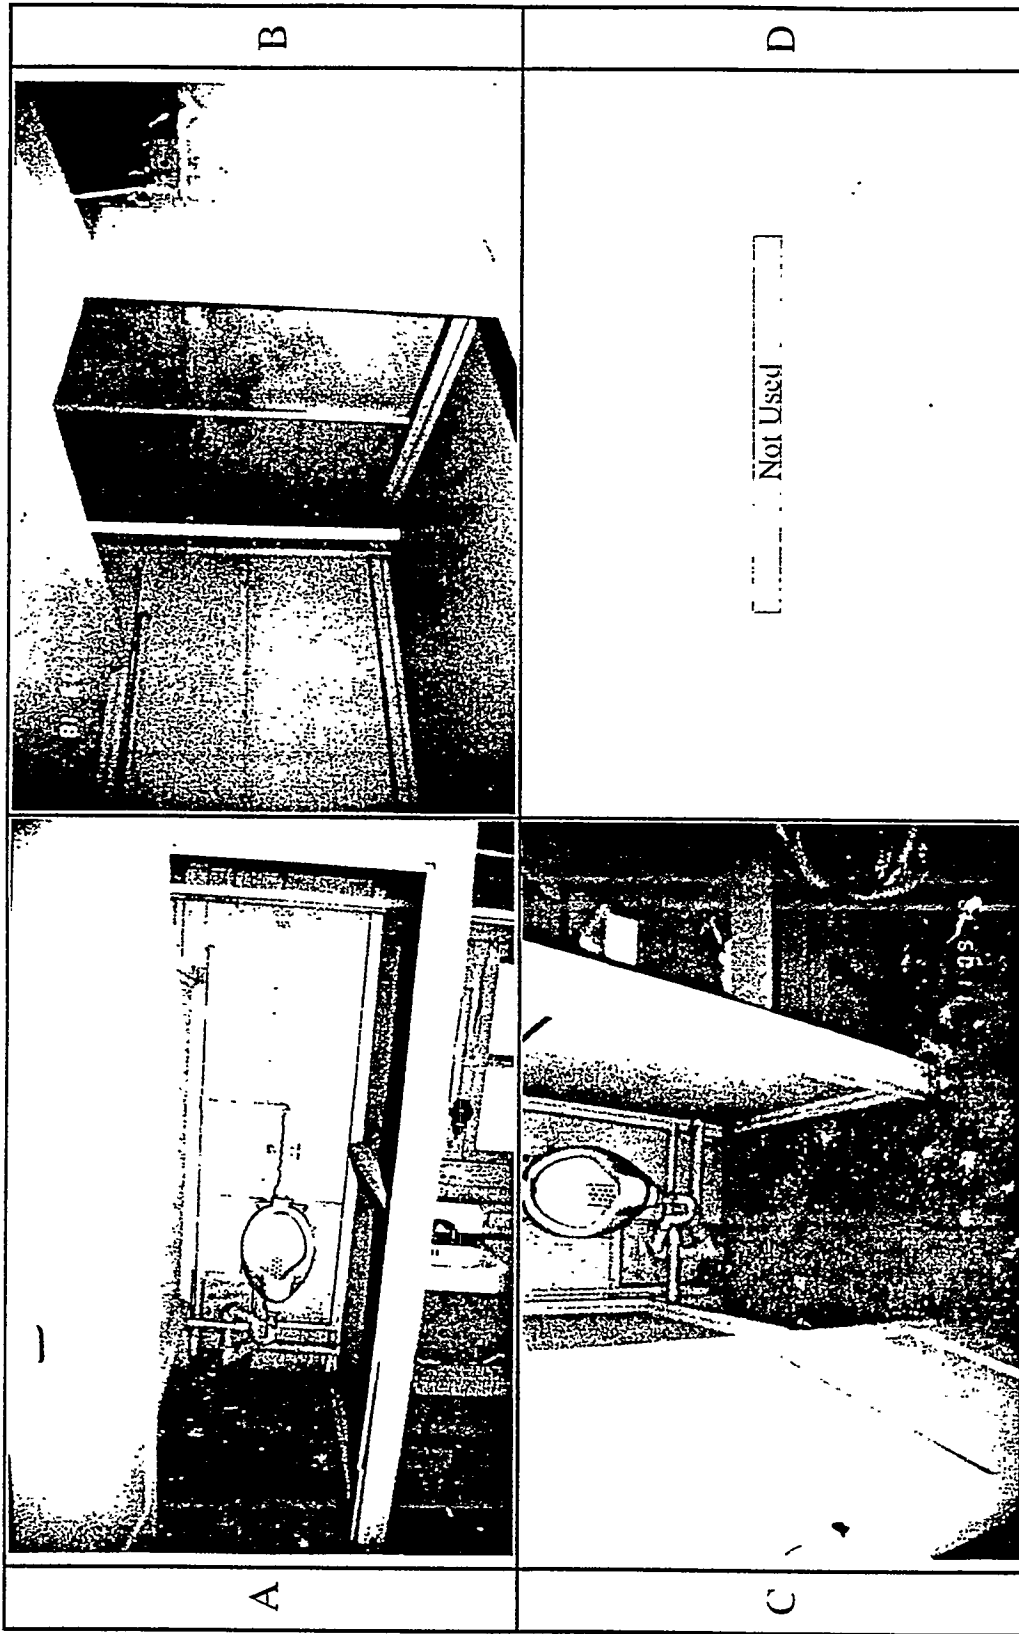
Photographs of Room 2 — Ceiling and Floor
